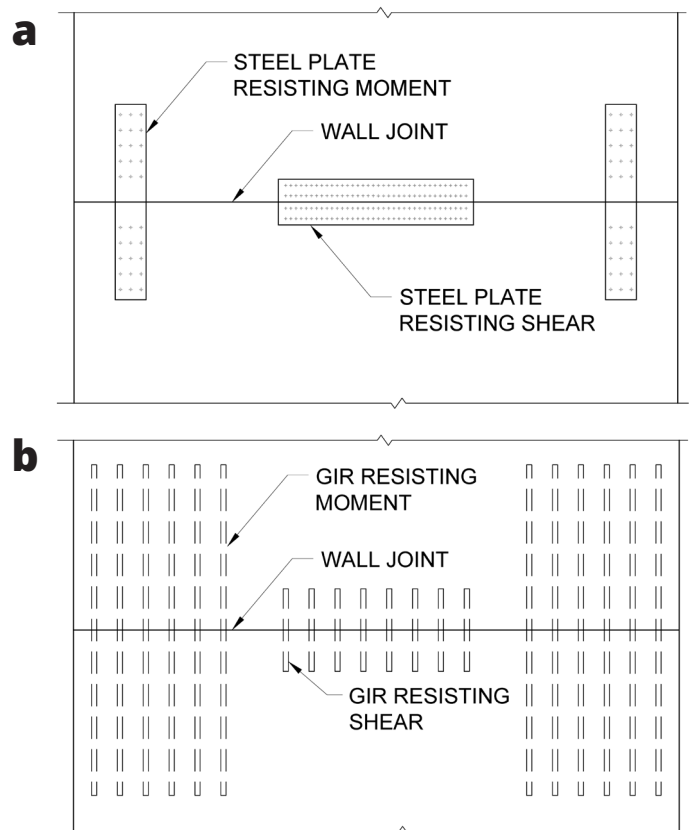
Examples of mass timber wall splice connections: (a) external steel plates; (b) internal GiRs.
